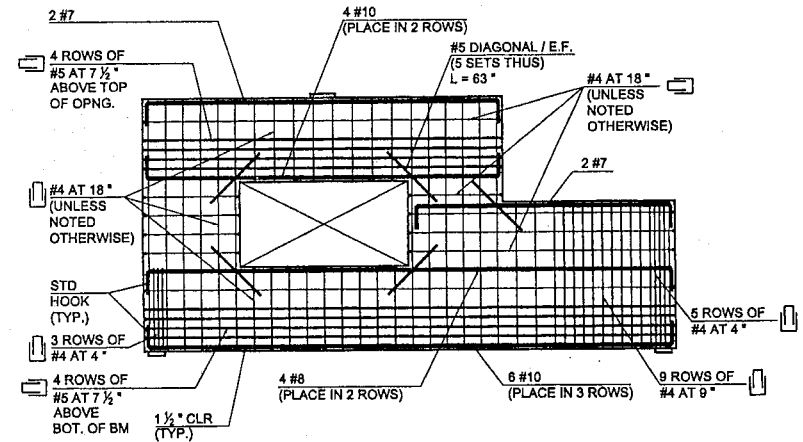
Final rebar layout according to the strut-and-tie-model
